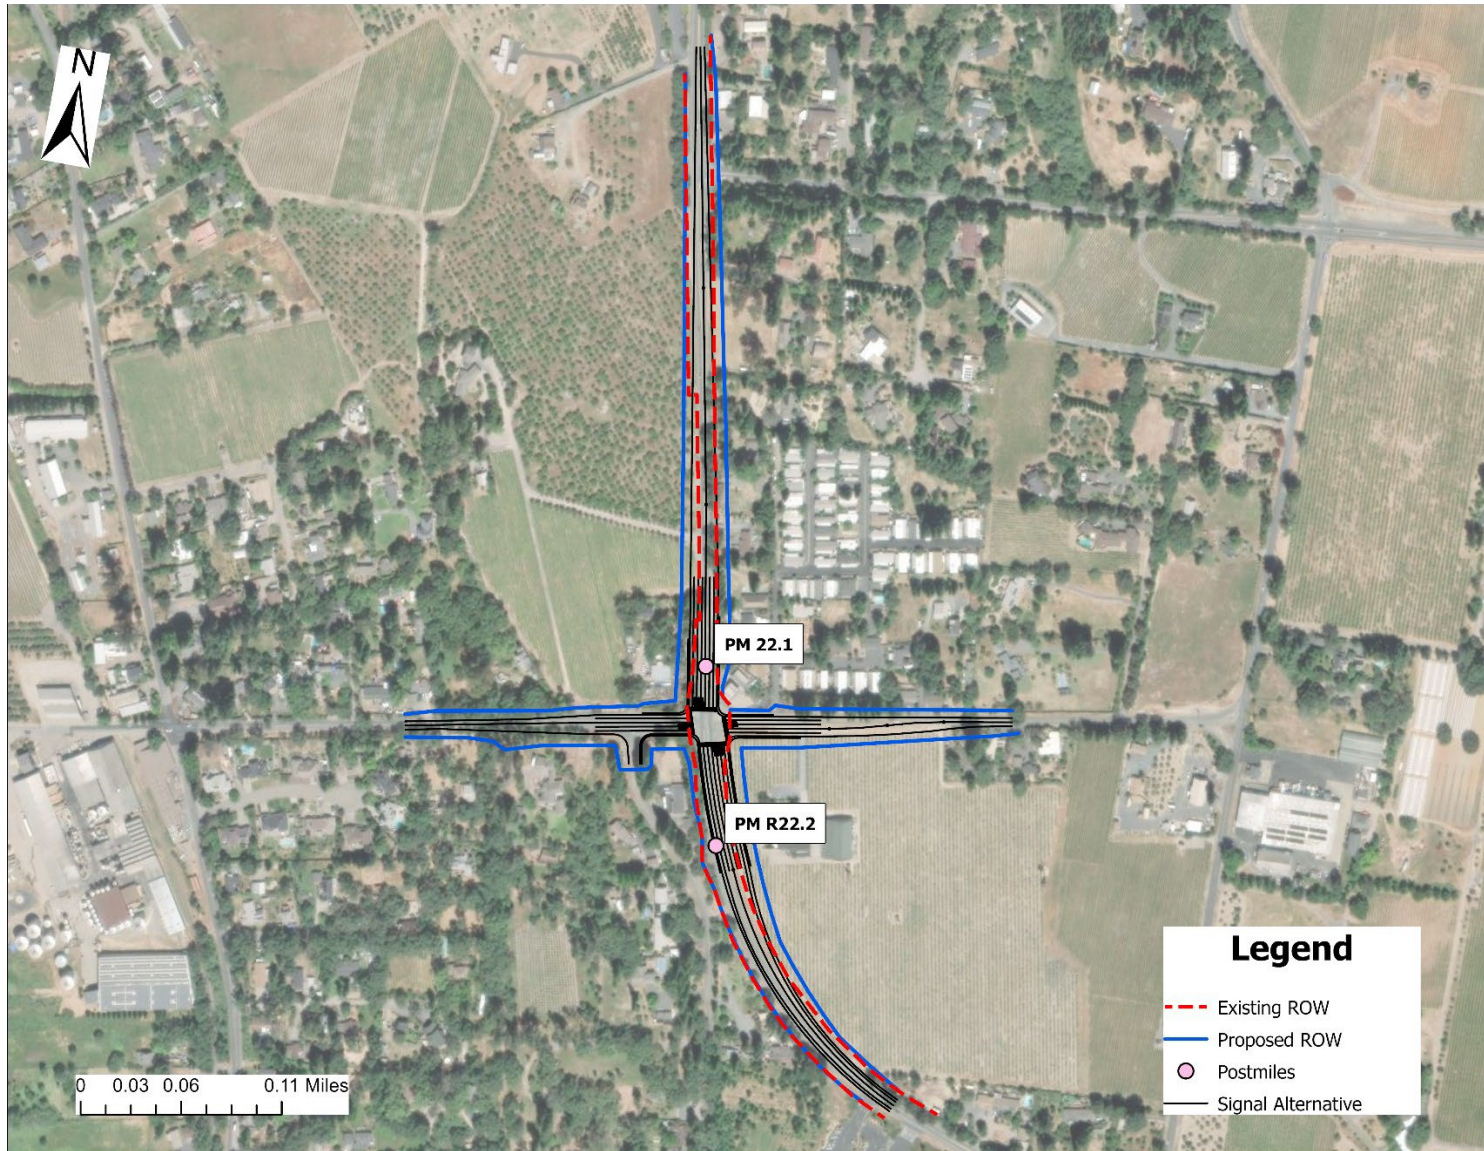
Overview of Alt 1. SR 116 runs north to south, while Green Valley Road runs east to west.
